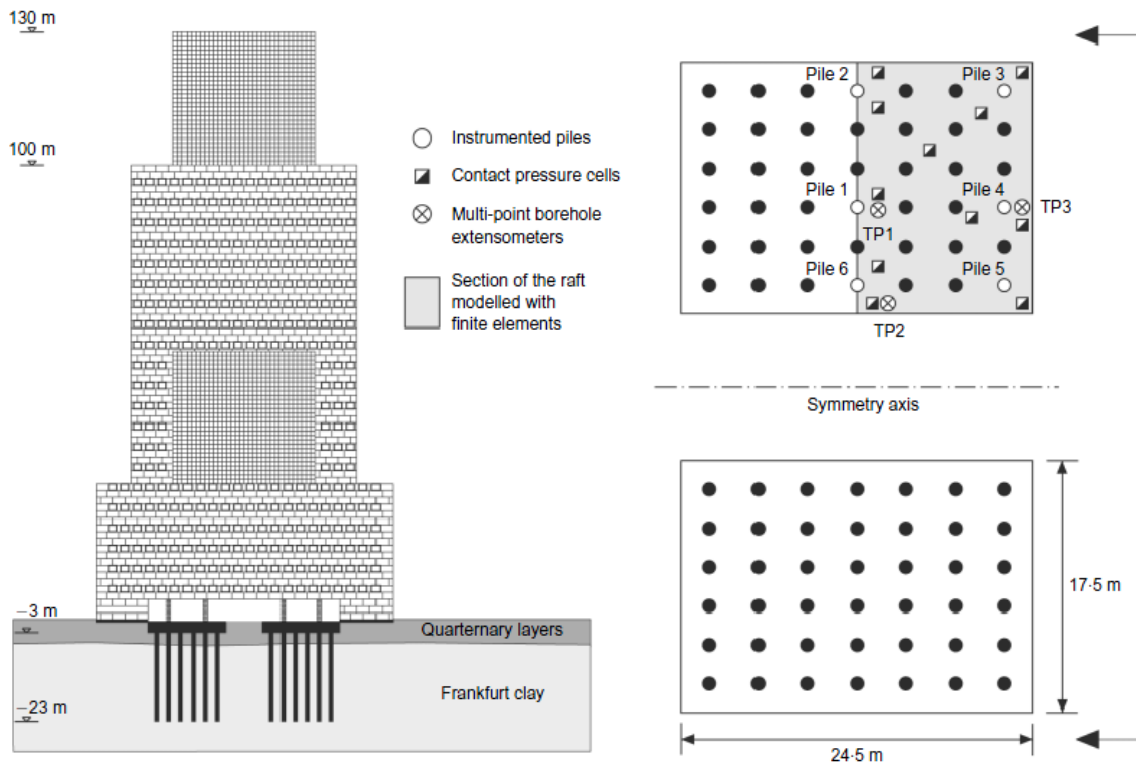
Messe-Torhaus Building cross-sectional view and piled raft layout with instrumentation (Reul, O & Randolph, M.F. (2003))
